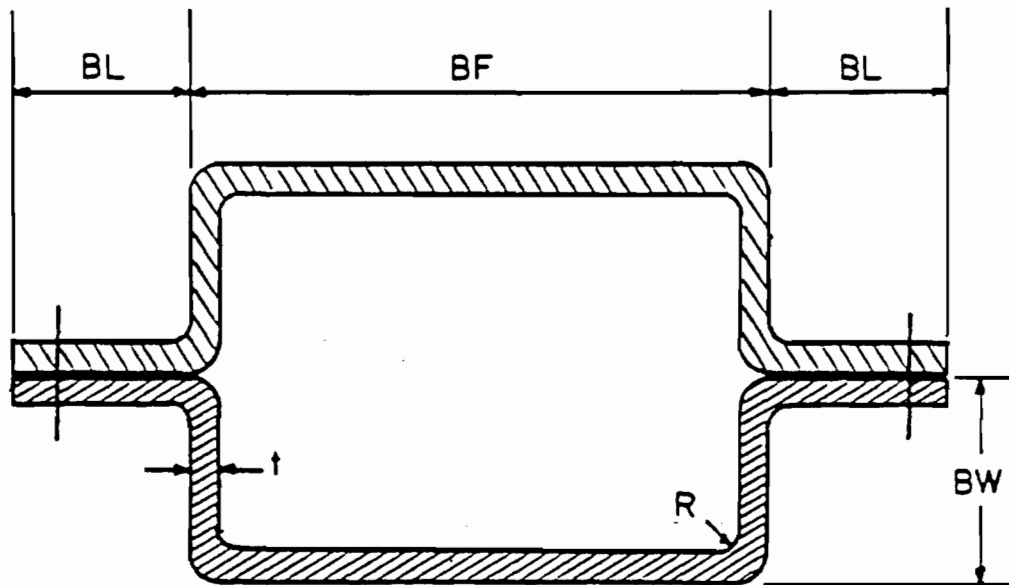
Cross Section of Box-Shaped Stub Columns Used for the Study of Stiffened Elements
